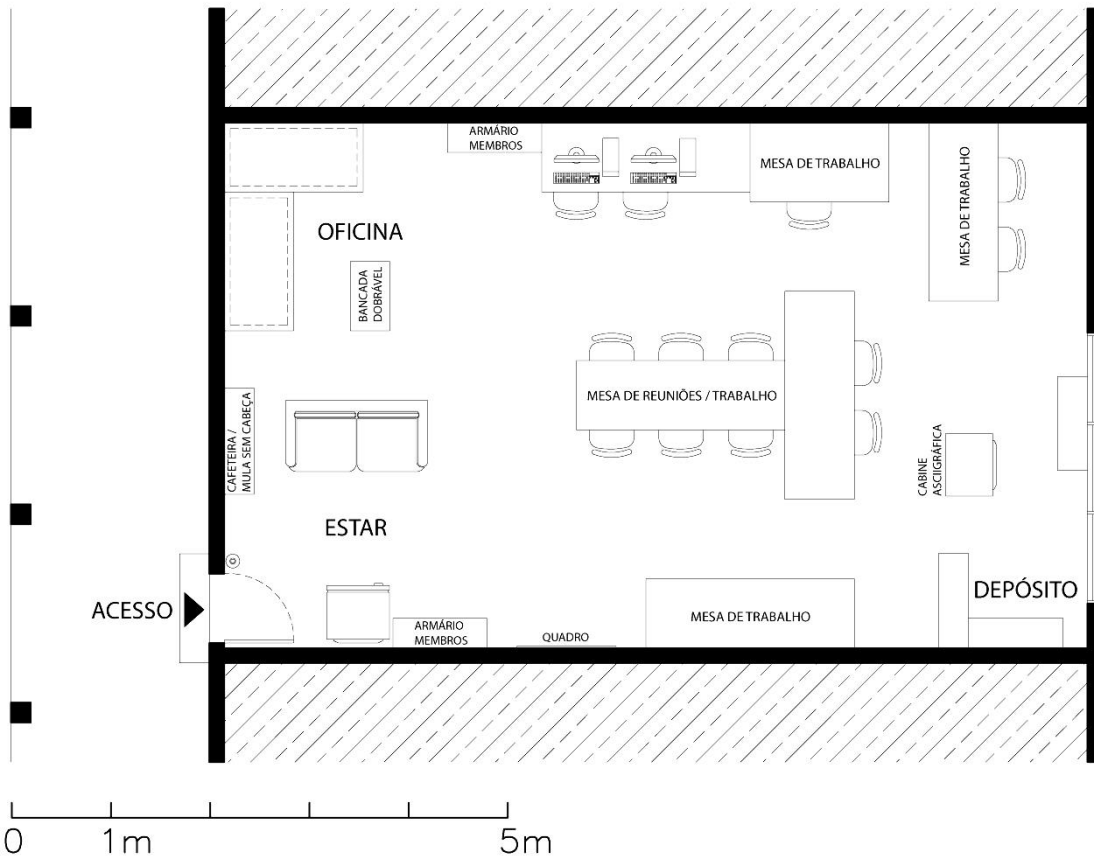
Floor plan of the Tarrafa HC, 2014. Source: by the authors.
